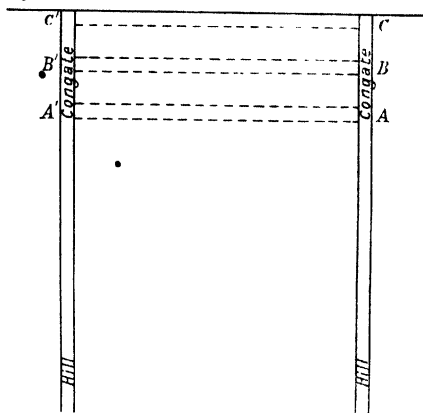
"HILL" SYSTEM, DETAILED PLAN OF WORKINGS. (Not drawn to Scale.)
